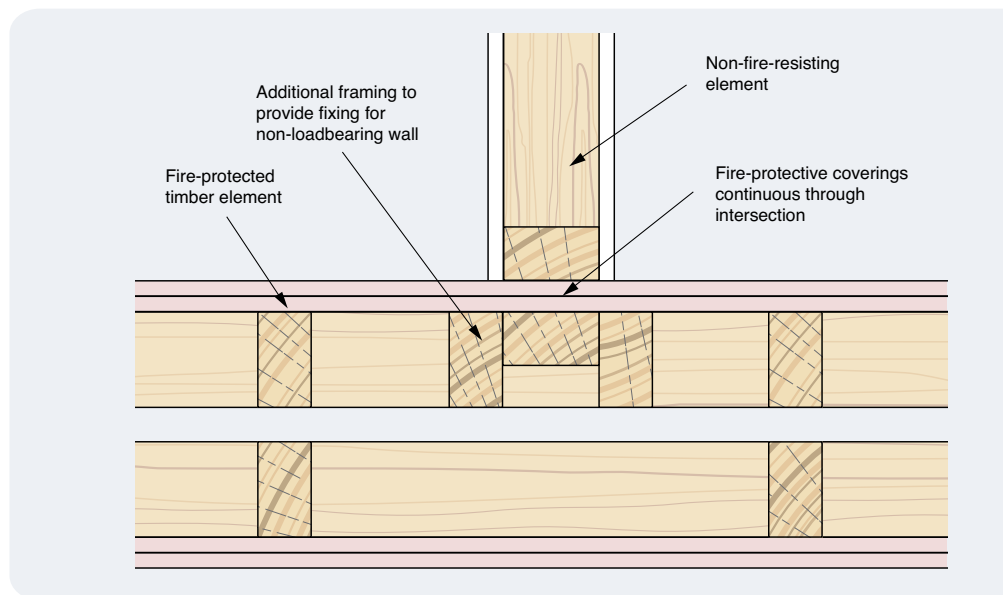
Junction of non-fire-resistant wall with fire-protected timber wall including additional framing detail.
